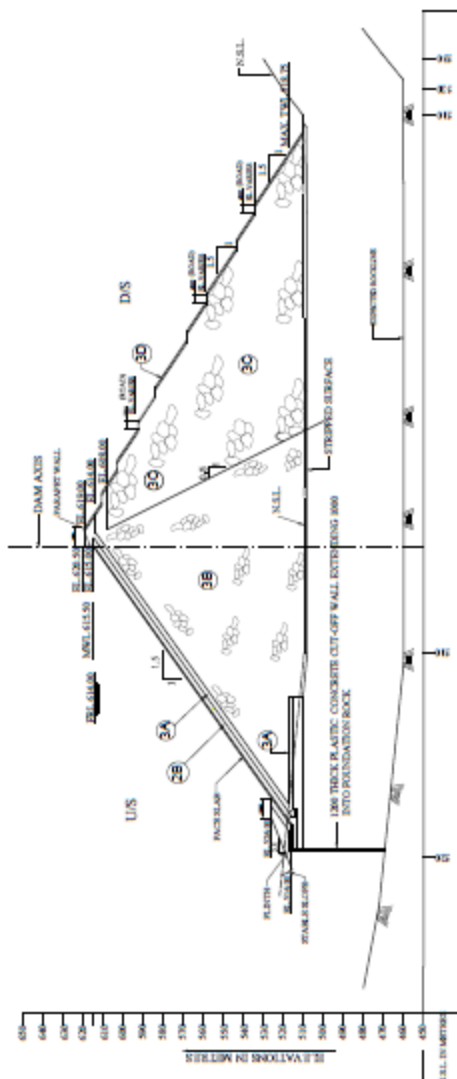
PLAN OF THE PROPOSED CONCRETE FACE ROCKFILL DAM FOR THE PROJECT
